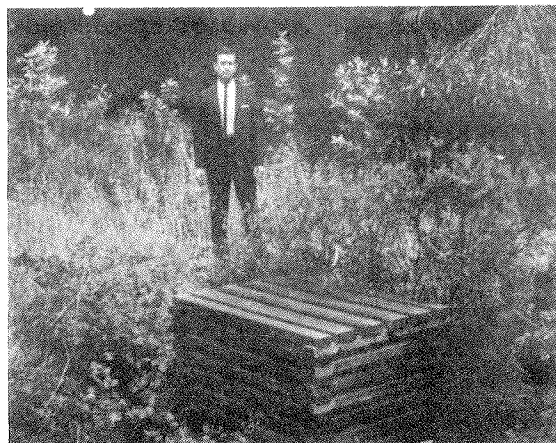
Redwood debris crib with spacing to prevent passage of fine material. Basin had built up 30'.
